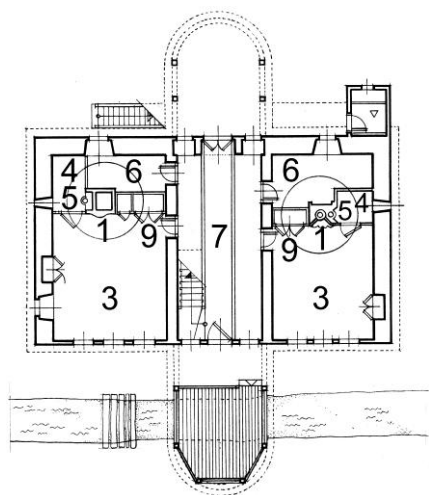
House floor plan [H-"M.A."], built in Gjakova
